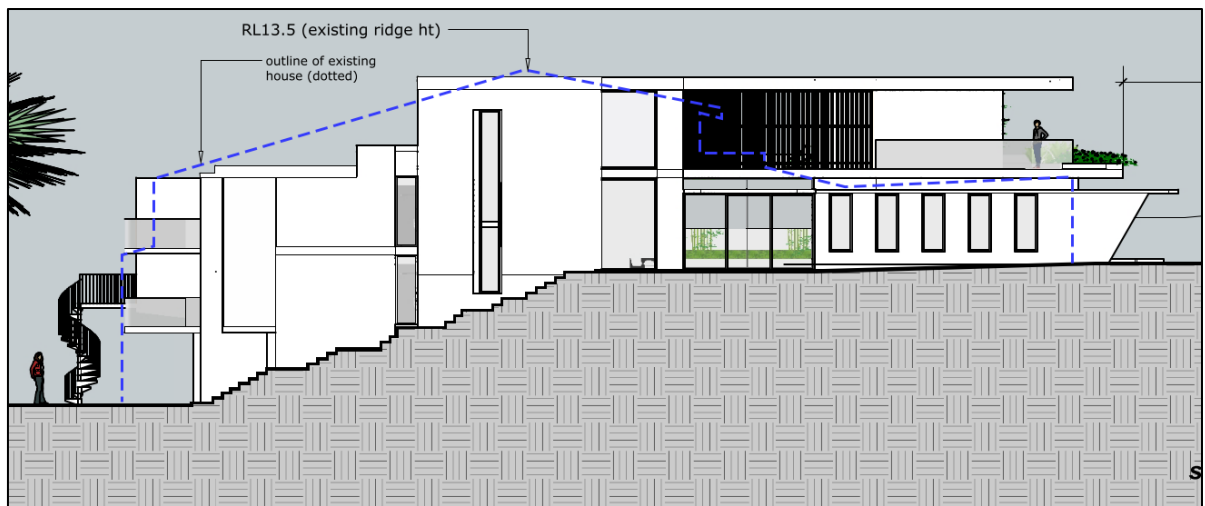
South elevation plan showing relocation of bulk from the rear first floor to the front of the dwelling above the garage (existing dwelling shown in blue dotted line)
